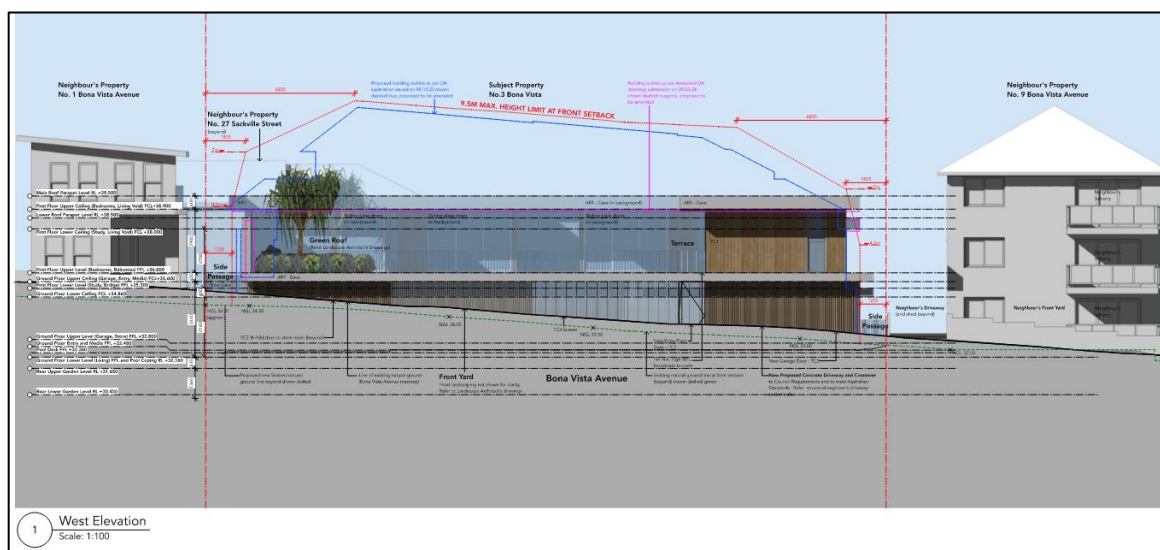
Amended Proposal at Subject Site after Council's RFI – West Elevation (appearance from the street) (Source: Dominic Levene)
